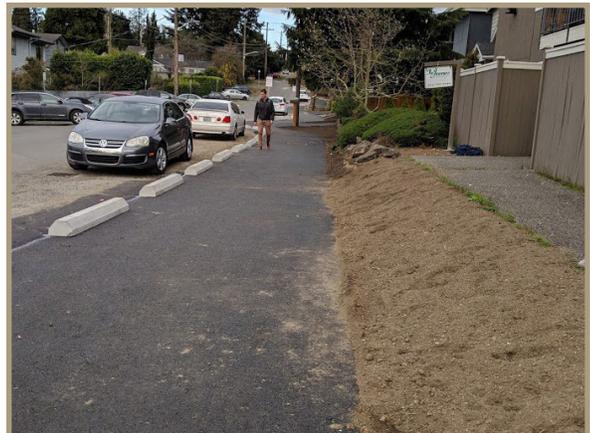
On-street sidewalk in Seattle. Photo: SDOT.
